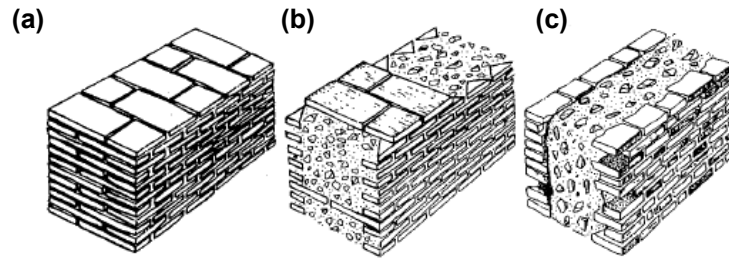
Roman masonry walls from Drysdale et. al. (2005) (a) bonded brick wall, (b) brick faced wall with header courses,(c) brick faced wall
